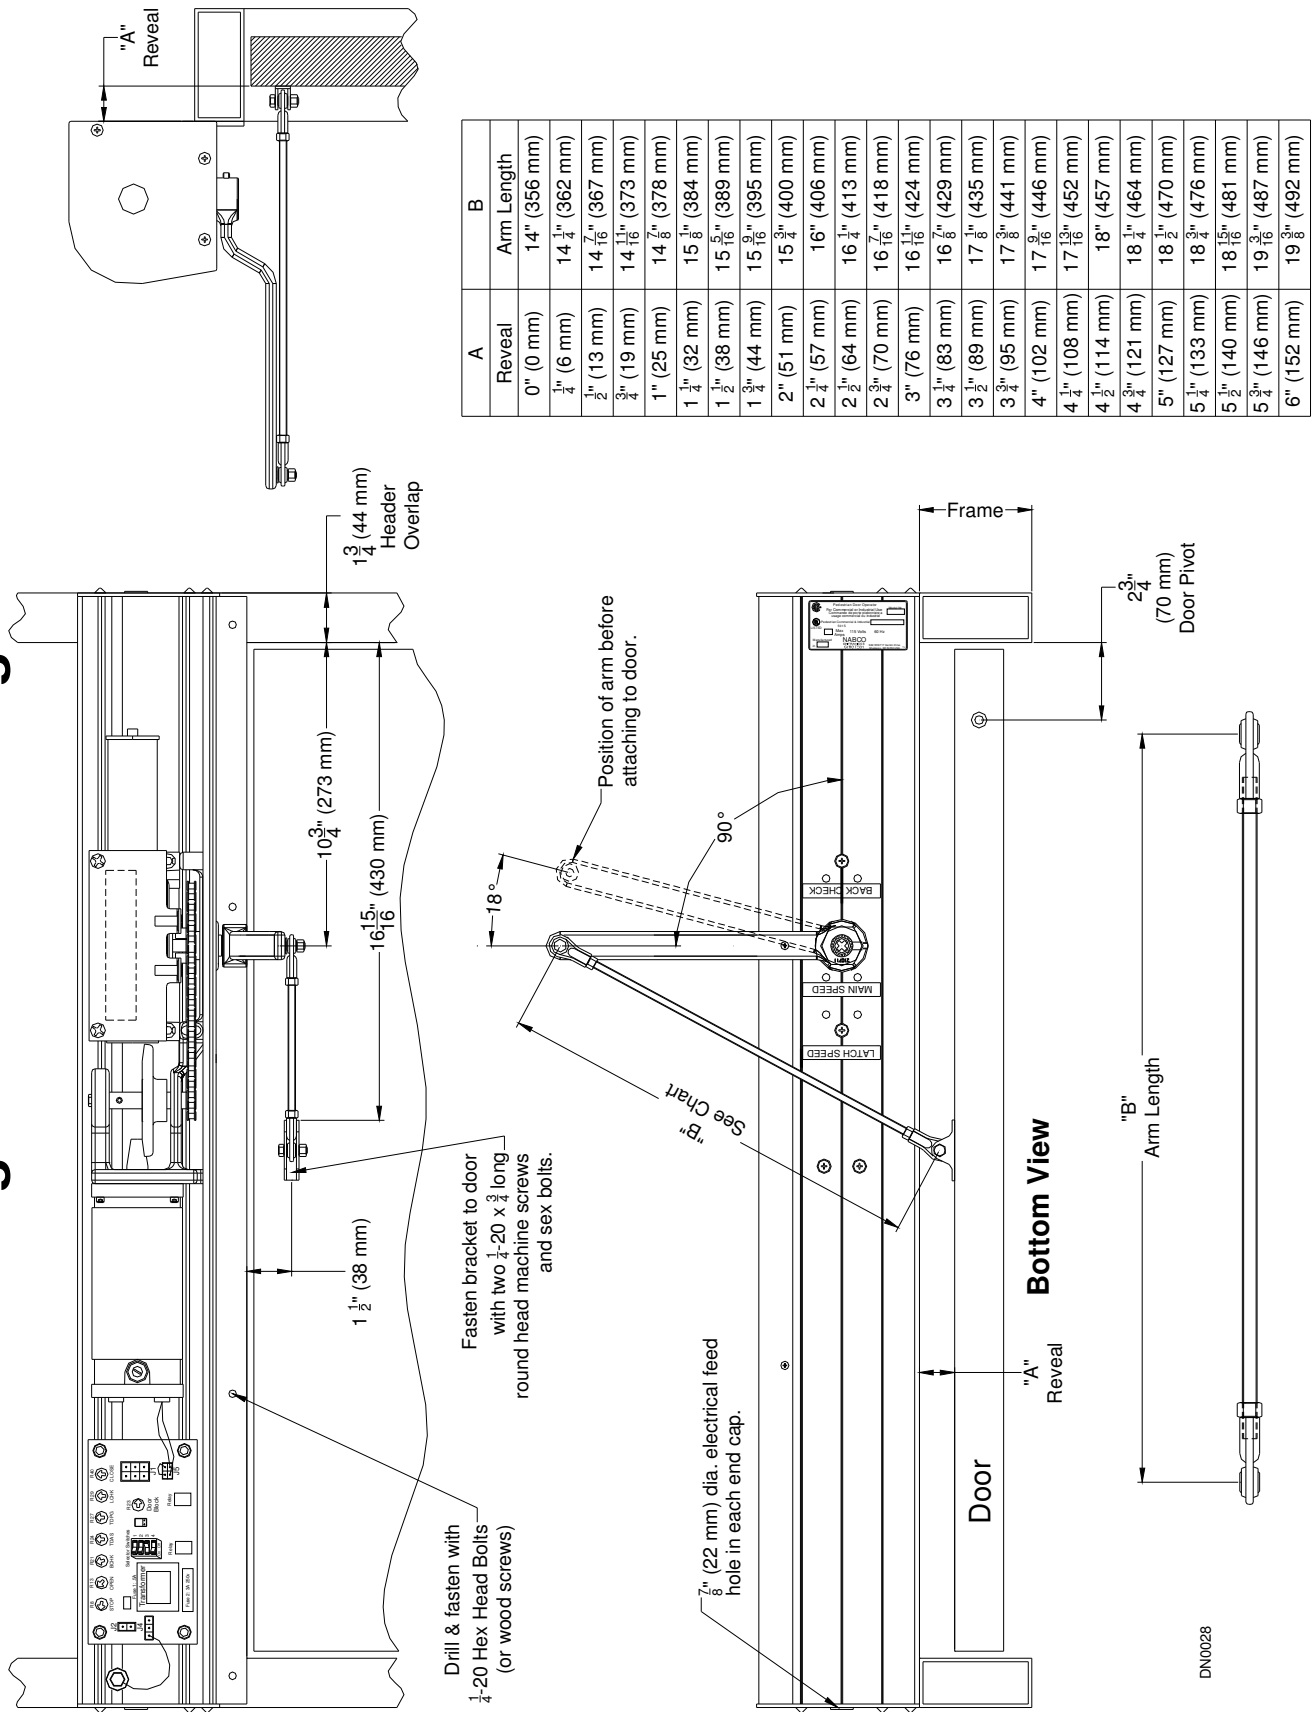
Installation Details, Right Hand Outswing Center Pivoted.
